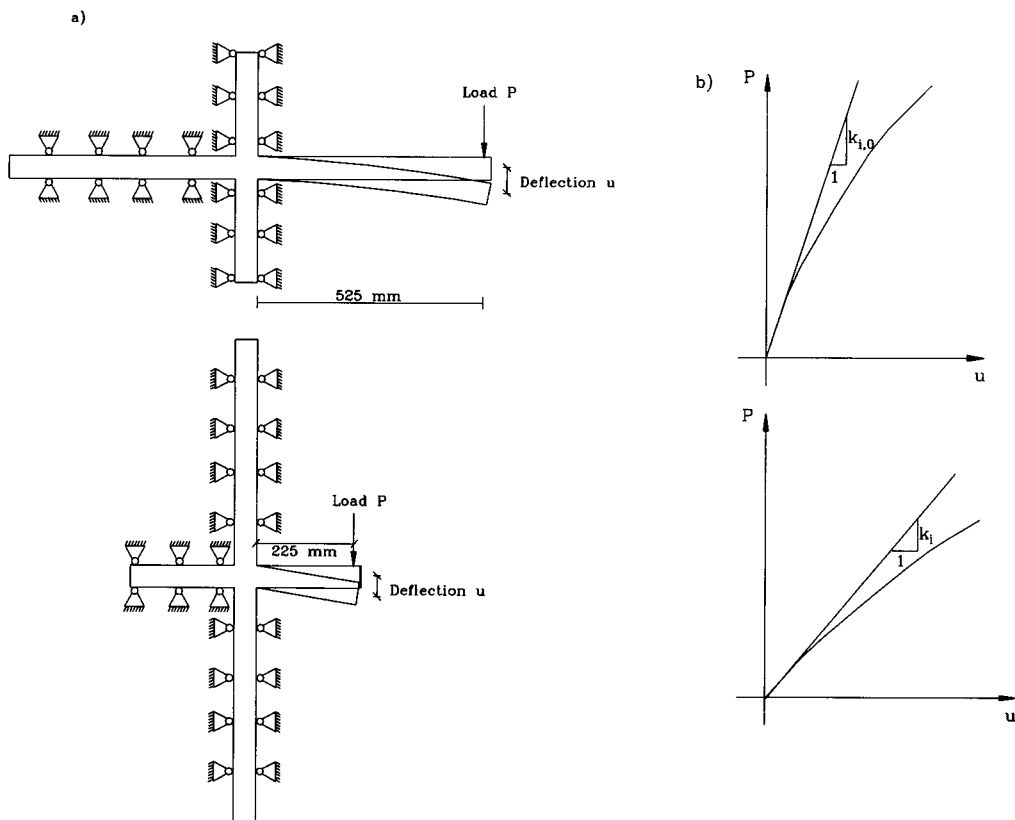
(a) Schematic view of the test set-up used for the static testing of beams and columns. (b) Definition of initial stiffness of undamaged and damaged specimen
